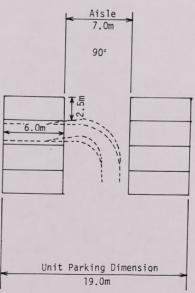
(f) UNIT PARKING DIMENSION(EXAMPLES)
